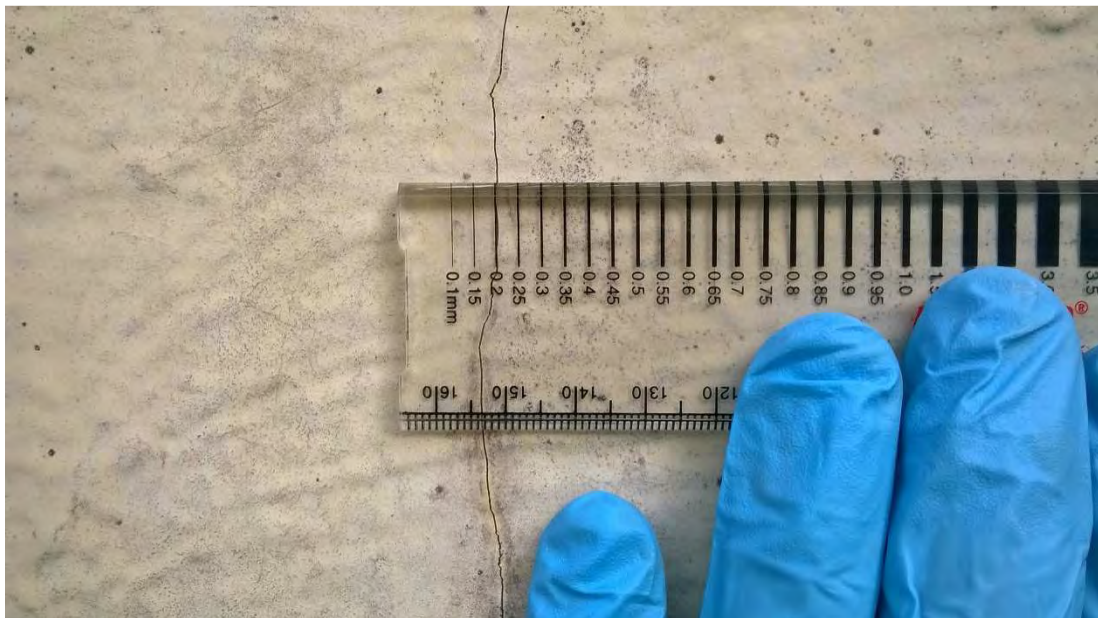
Acetic Acid – Crack in concrete block masonry wall (2)
